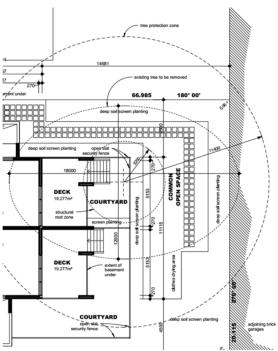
Ground Floor Plan showing (from centre) the structural root zone, canopy spread, and tree protection zone, of the existing Jacaranda mimosifolia (MacGillivray Architects, 2017)
